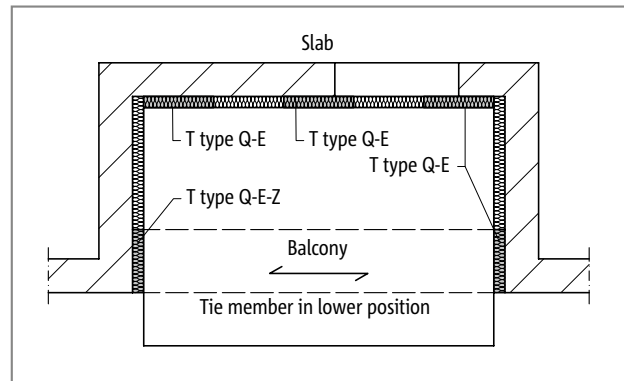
Schöck Isokorb® T type Q-E, Q-E-Z: Recessed balcony supported on three sides with tie member
